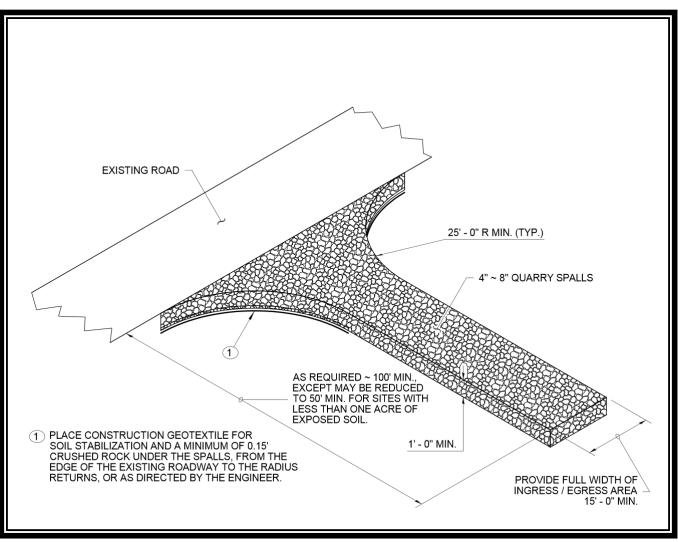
Stabilized Construction Entrance. (Drawing courtesy of WSDOT Standard Plans)
